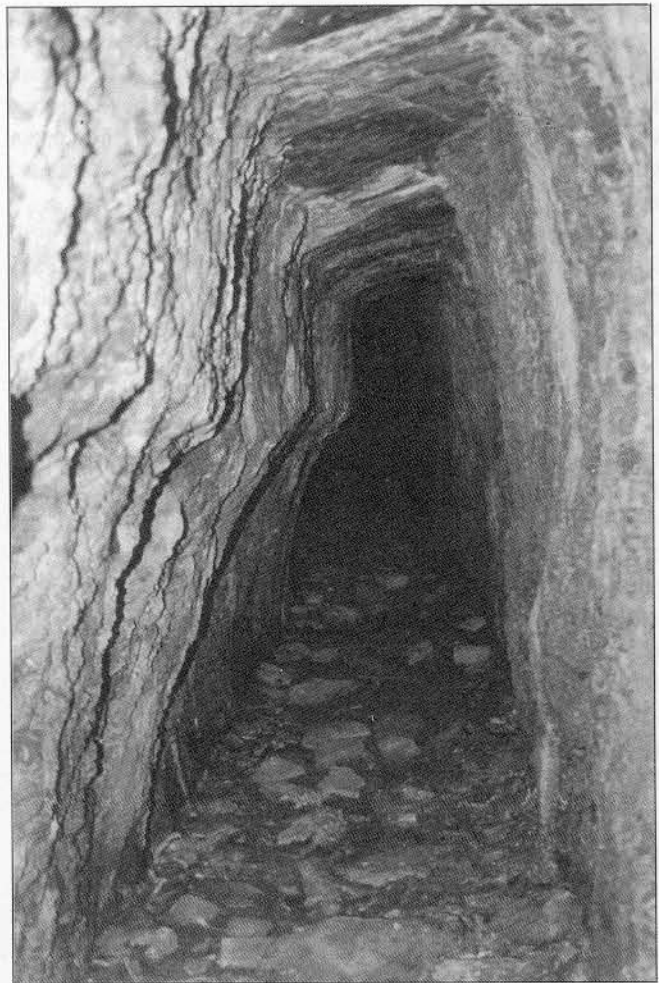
Inside leat tunnel, Broadmoorham Wood. (C. Vulliamy)
